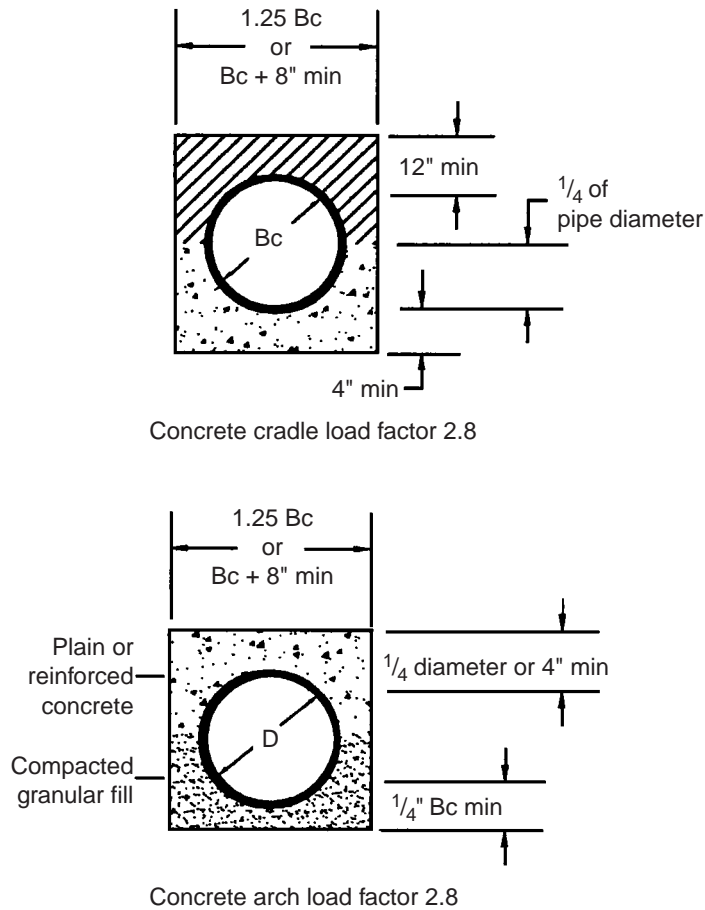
Class A pipe bedding detail. (American Society of Civil Engineers, *Design and Construction of Sanitary and Storm Sewers*, 1969. Used with permission of ASCE.)
